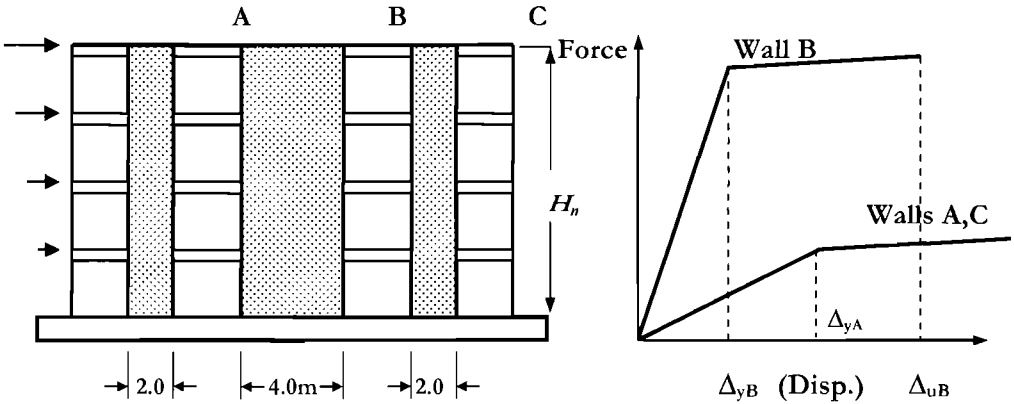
Structural Wall Building for Examples 3.5, 3.6, and 3.7
